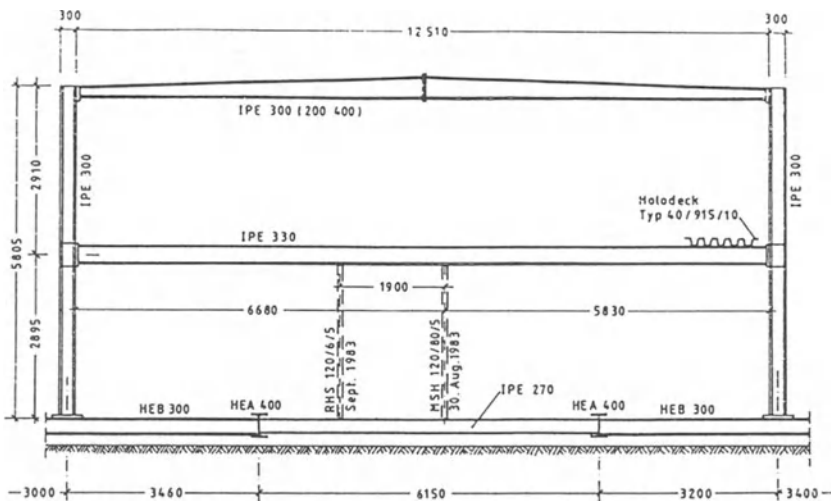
Framed steel structure built on a concrete building in Zurich, Switzerland
